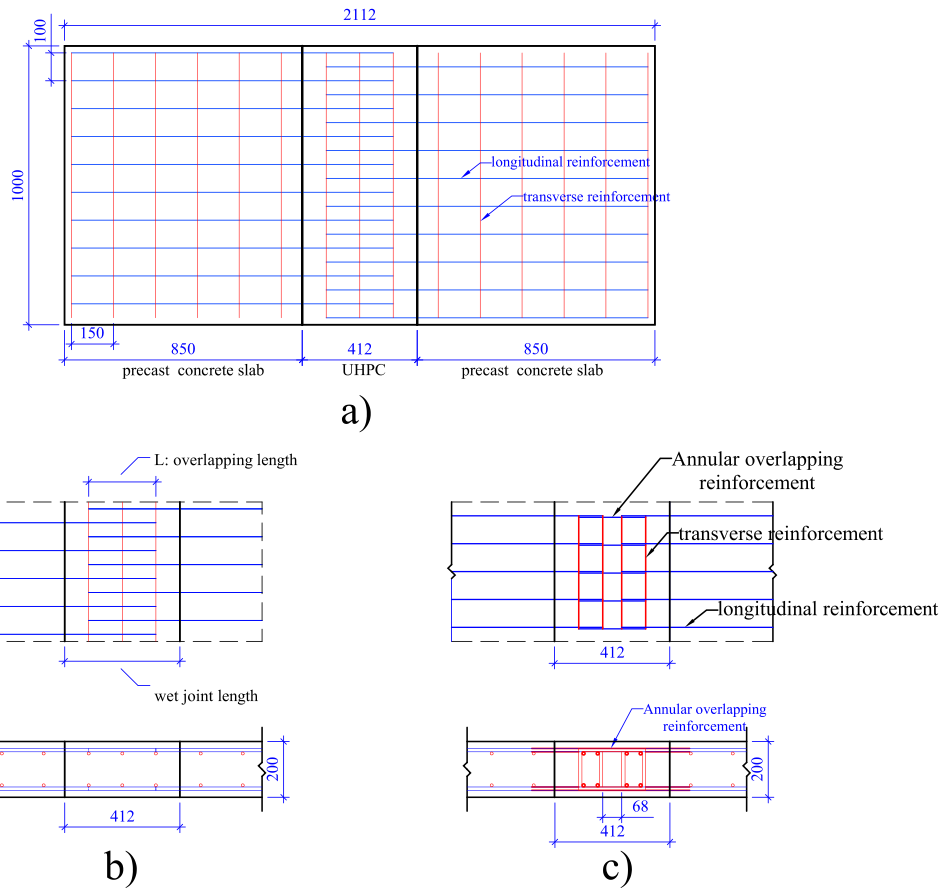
Geometry of the tested slabs (dimensions in mm): a) Top view; b) cross-section view of the connection or wet joint with straight lap length or overlapping length; c) Annular overlapping of the reinforcement. Source: Adapted from Deng et al. [27].
